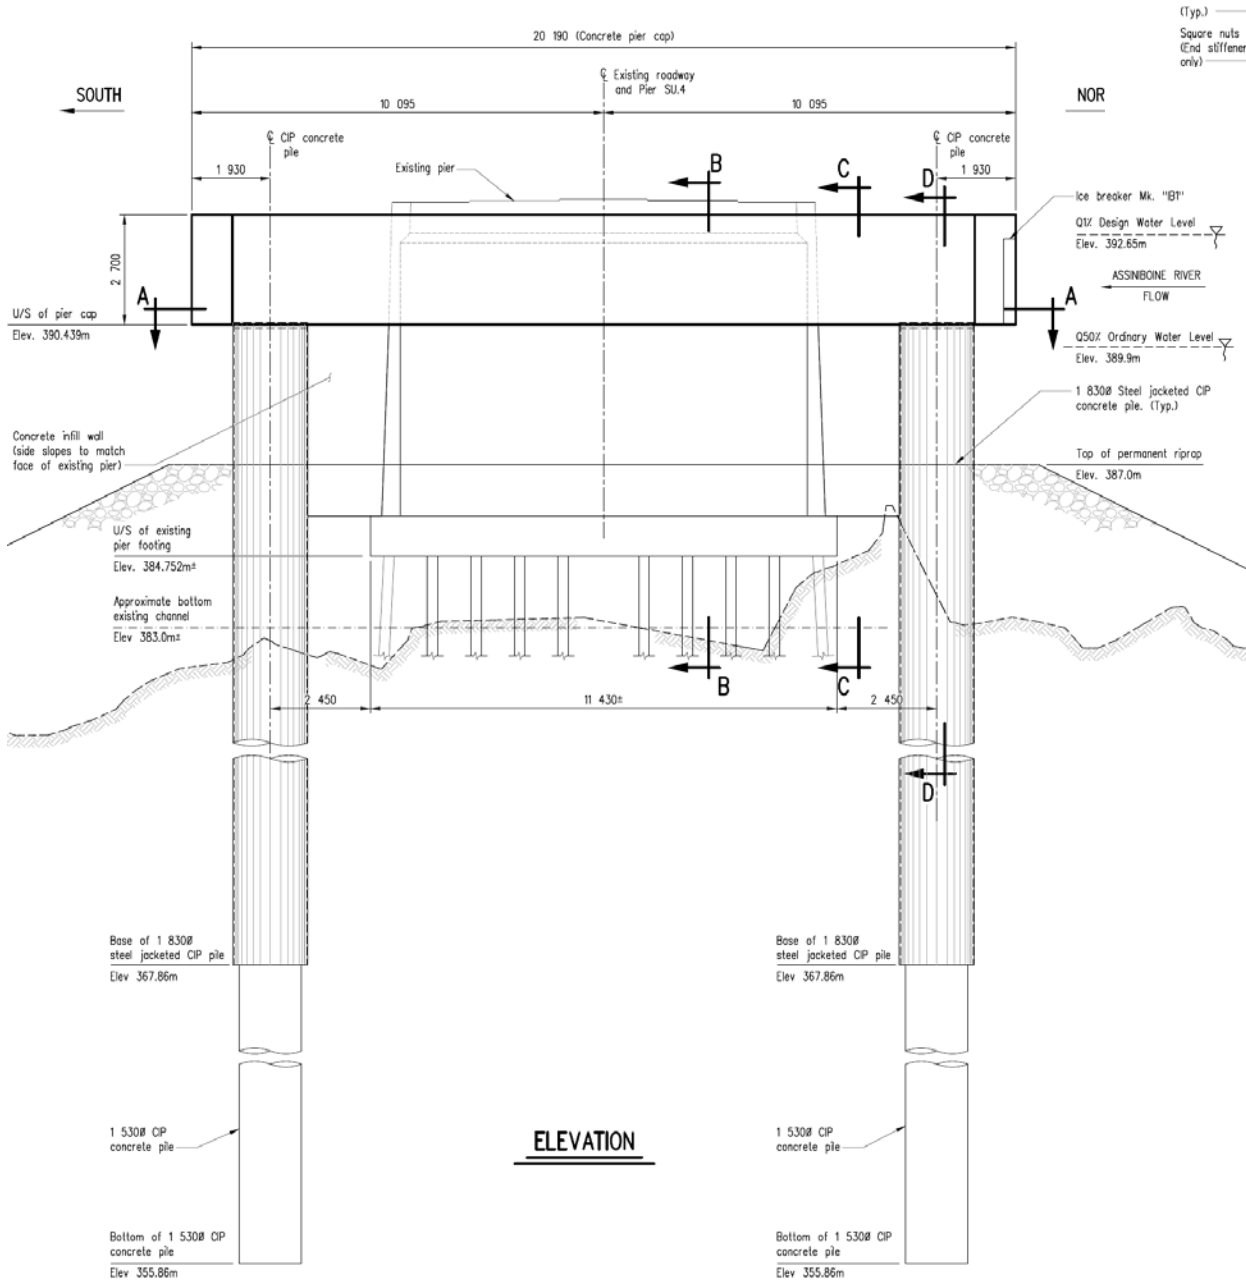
Section of Pier, Showing Drilled Shaft Foundation and Concrete Pier Cap
